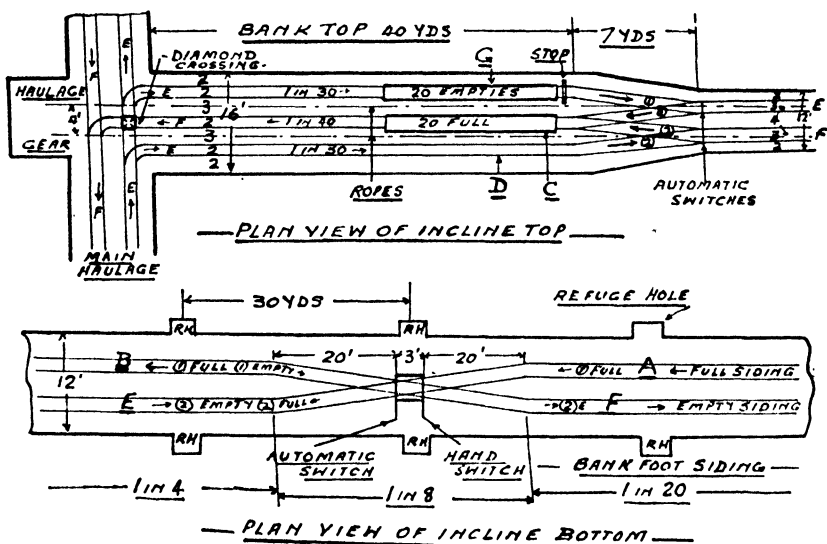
Arrangement of Balanced Double-drum Haulage Incline.
